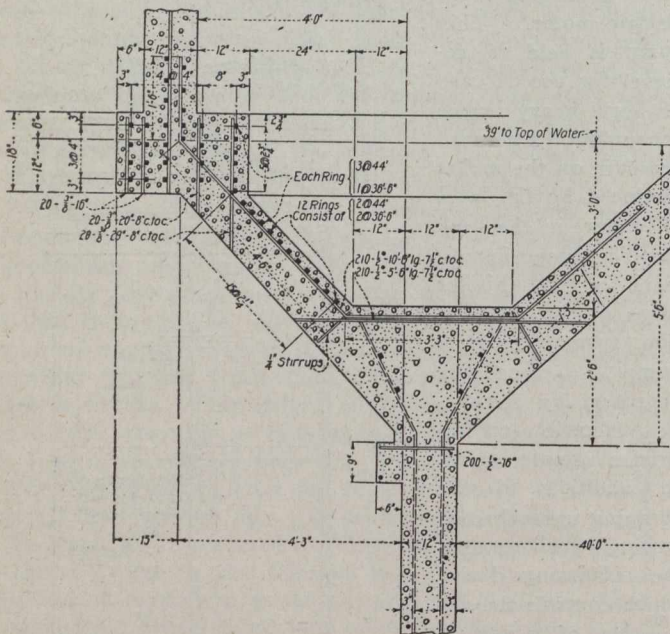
Detail of Concrete Reinforcement at Intersections of Outer Dome, with Inner Dome and Tank Wall.
